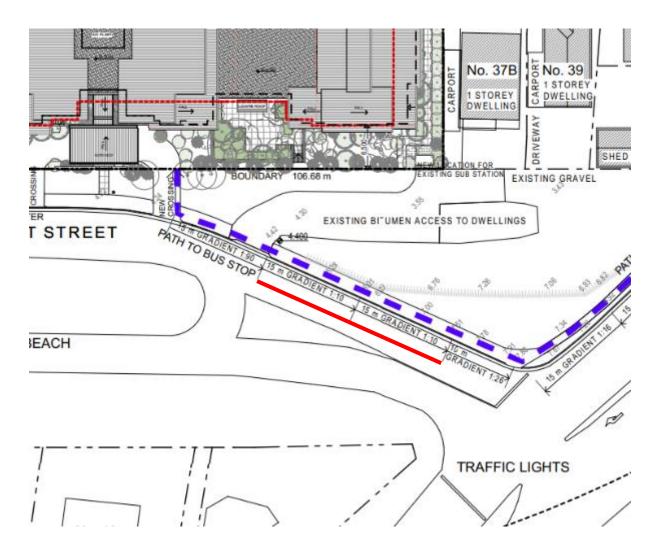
Plan extract showing the 30 metre section of pathway with a gradient of 1:10 (in red) adjacent to the front boundary of the site
